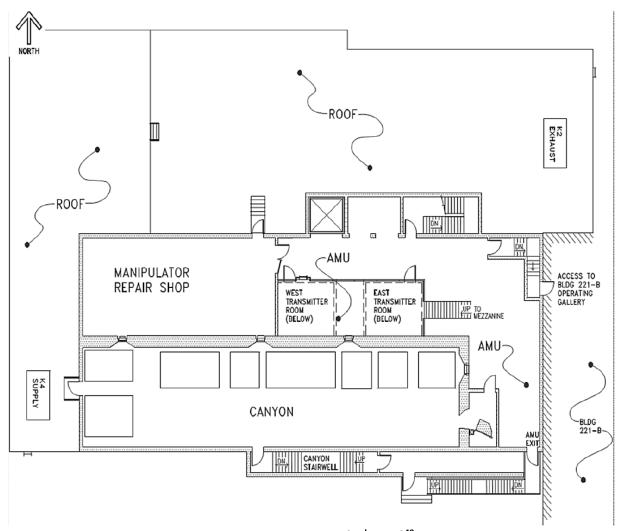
WESF Pool and Process Cells Building Layout (2nd Floor)⁴⁸
